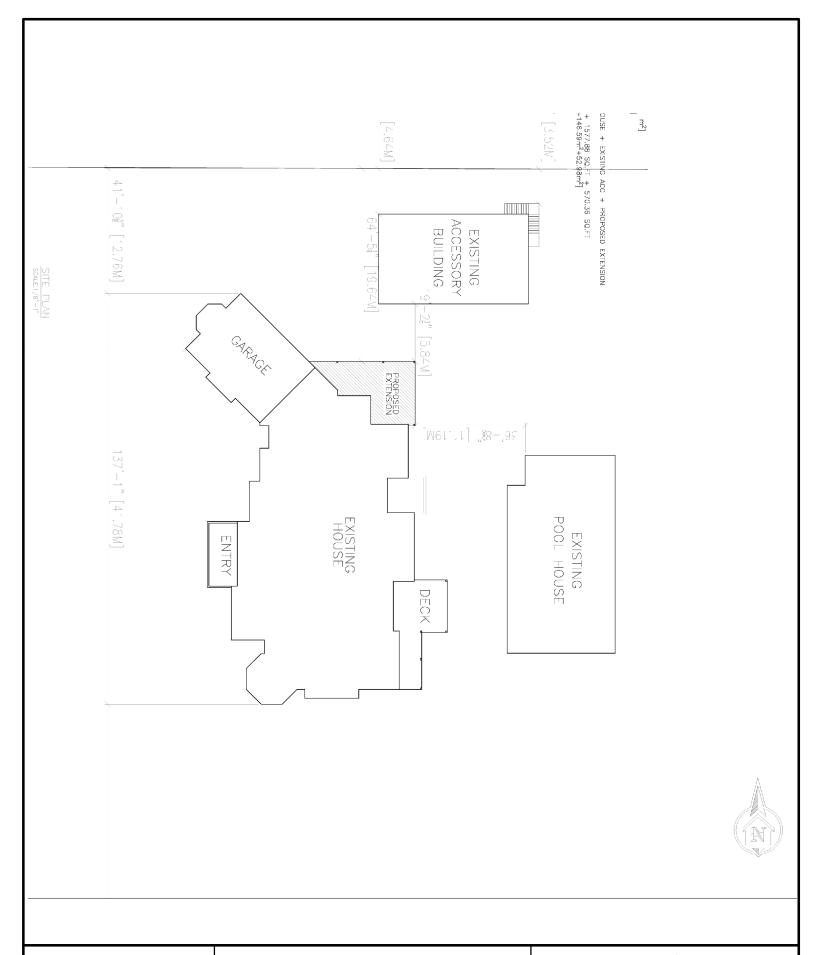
Proposed Site Plan File No.: PRJ24-156
